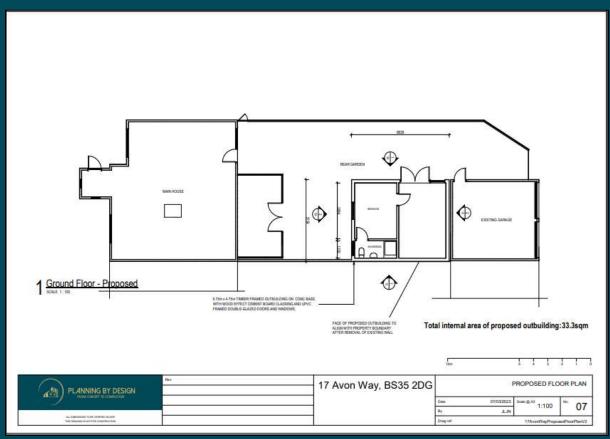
Proposed Floor Plan (not to scale, please see planning drawings)
